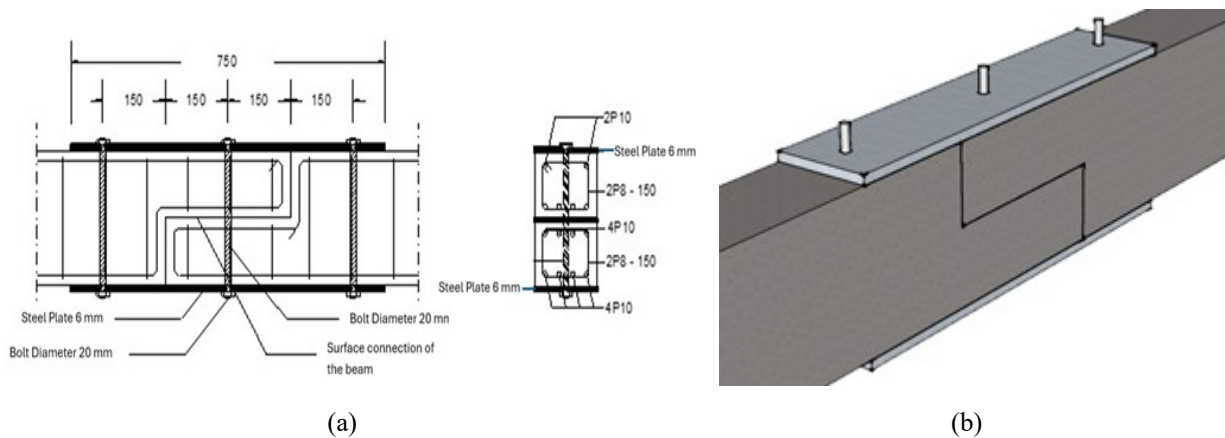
The detailing of steel plate covering at the connection of the BC-1 (unit in mm)
